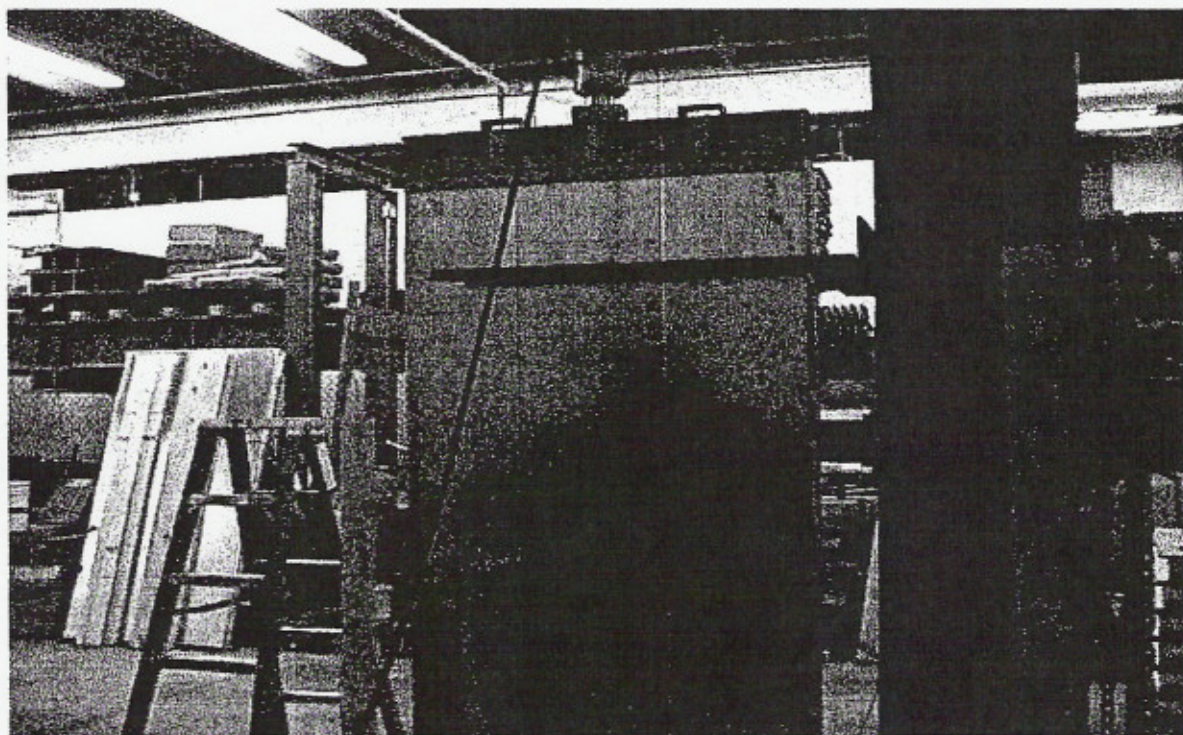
Test Setup for Compressive Loading 8' Galv.-Galv. Panel
